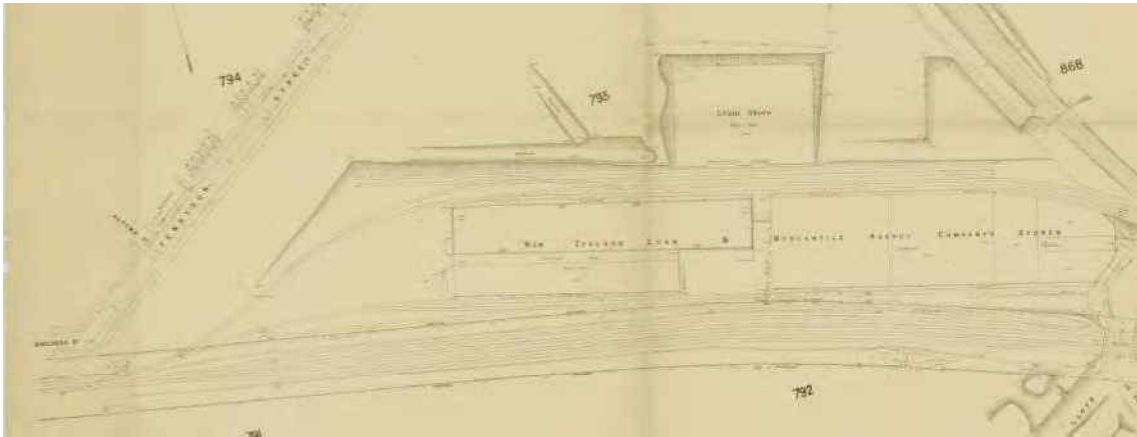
1897 MMBW Detail Plan No. 793 Borough of Flemington & Kensington, east of Tennyson Street showing the layout of the NZ Loan & Mercantile Agency Co Stores buildings
